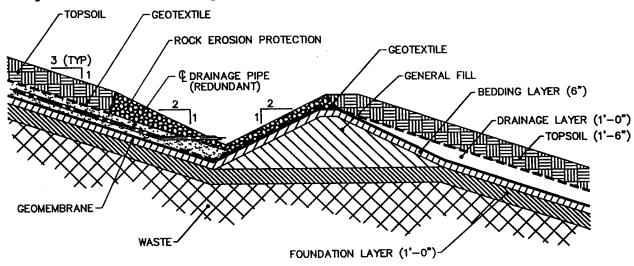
TYPICAL LANDFILL COVER SECTION WITH GEOMEMBRANE BARRIER LAYER AND INTERMEDIATE BENCH DITCH
